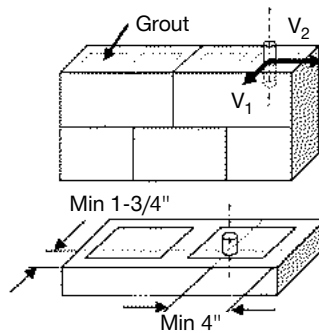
KWIK Bolt 3 installed in the top of masonry walls
